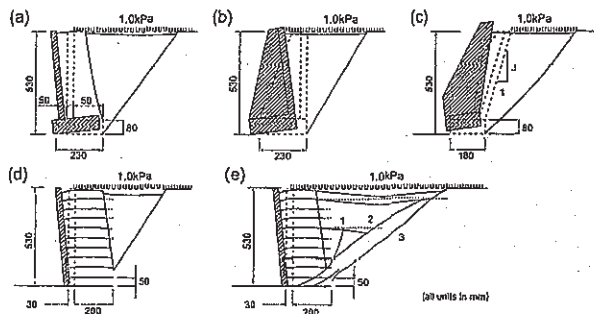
Initial and displaced locations and observed failure planes in the model retaining walls: (a) cantilever-type; (b) gravity-type; (c) leaning-type ; (d) reinforced soil, Type 1; (e) reinforced soil, Type 2.
